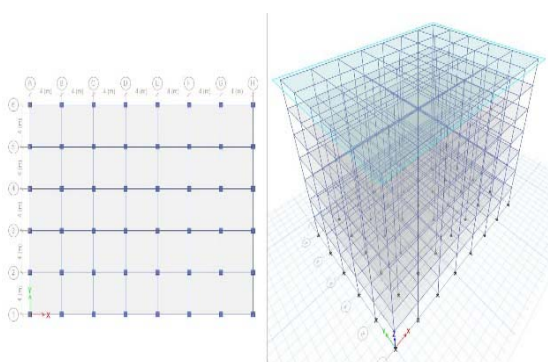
Rectangular Shaped Plan and elevation of 8 storied building
